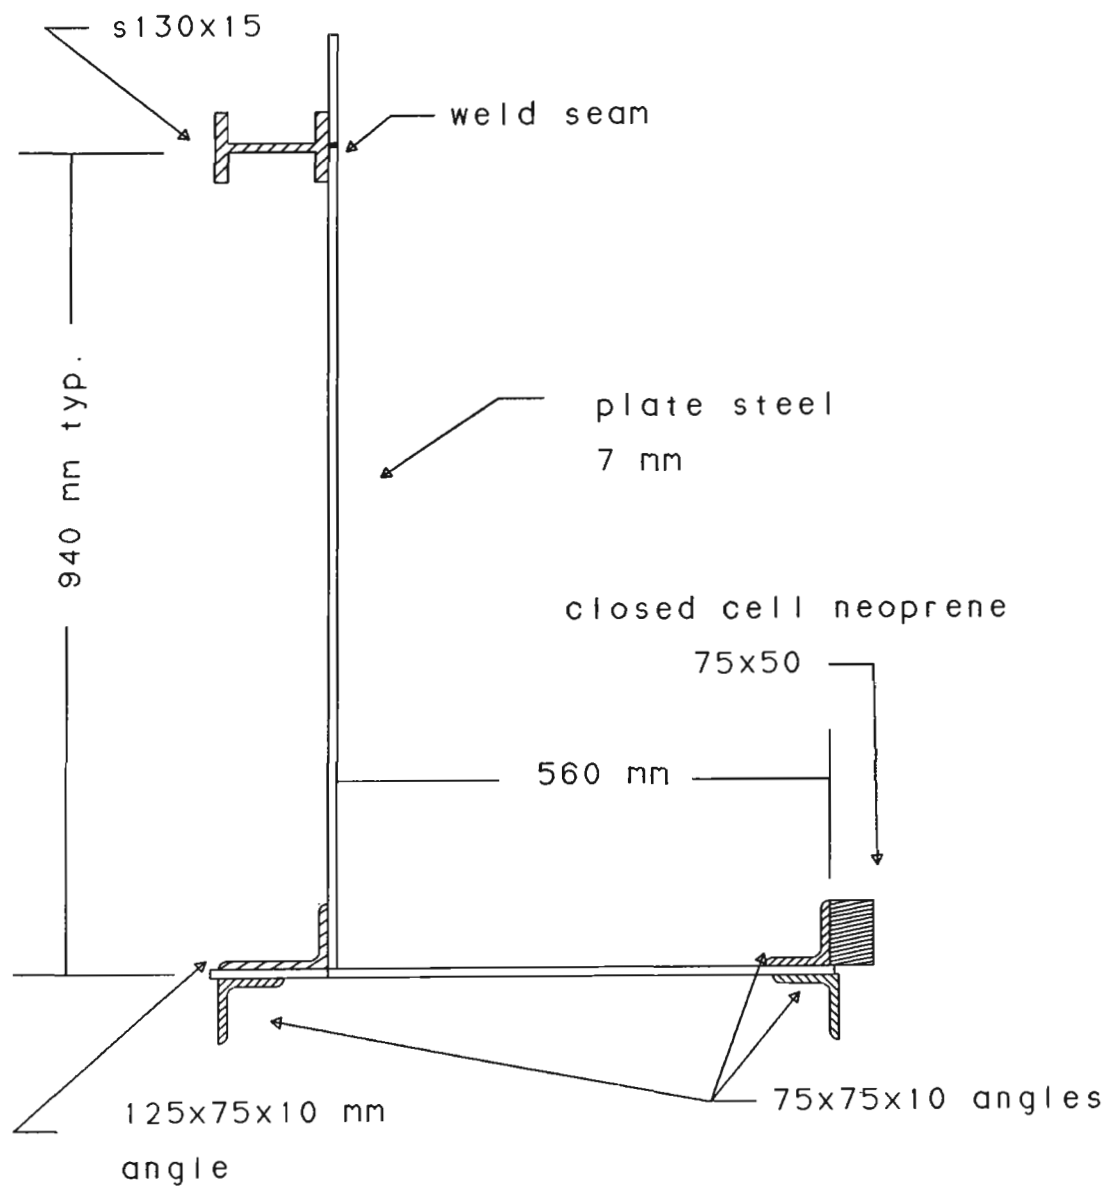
HORIZONTAL SECTION THROUGH PRESSURE CHAMBER WALL
